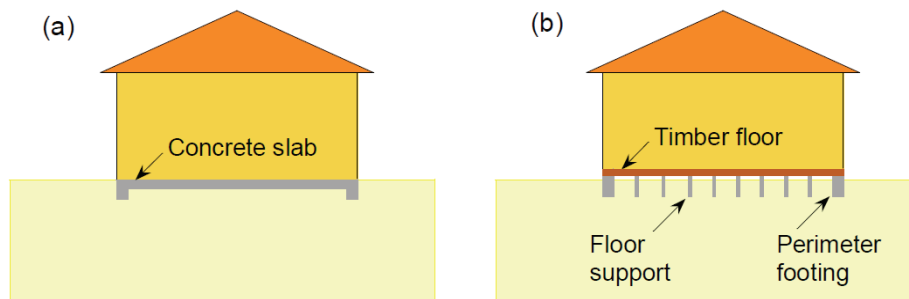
Prevalent house foundation types in Christchurch: (a) concrete slab; (b) concrete perimeter footing
